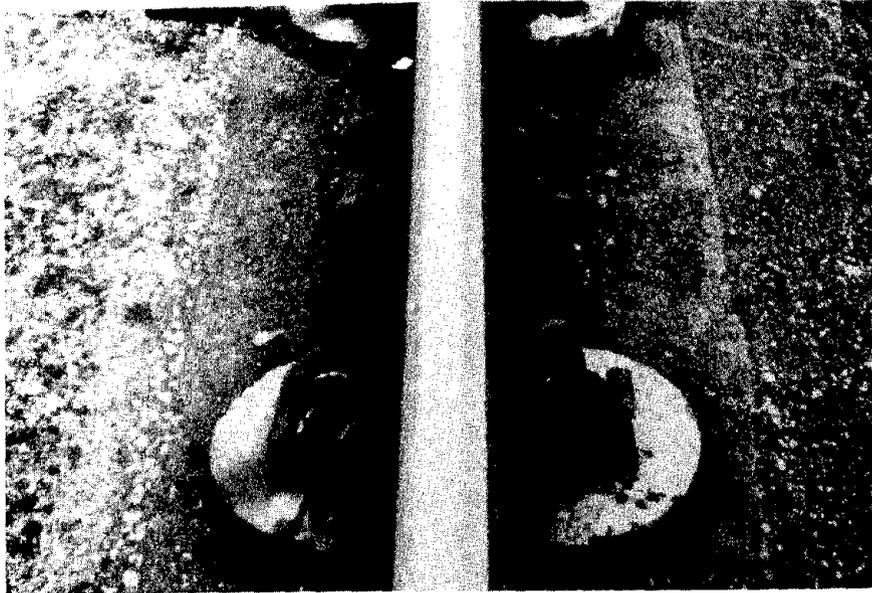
NEW FASTENERS INSTALLED NEAR LOOSE INSERTS
